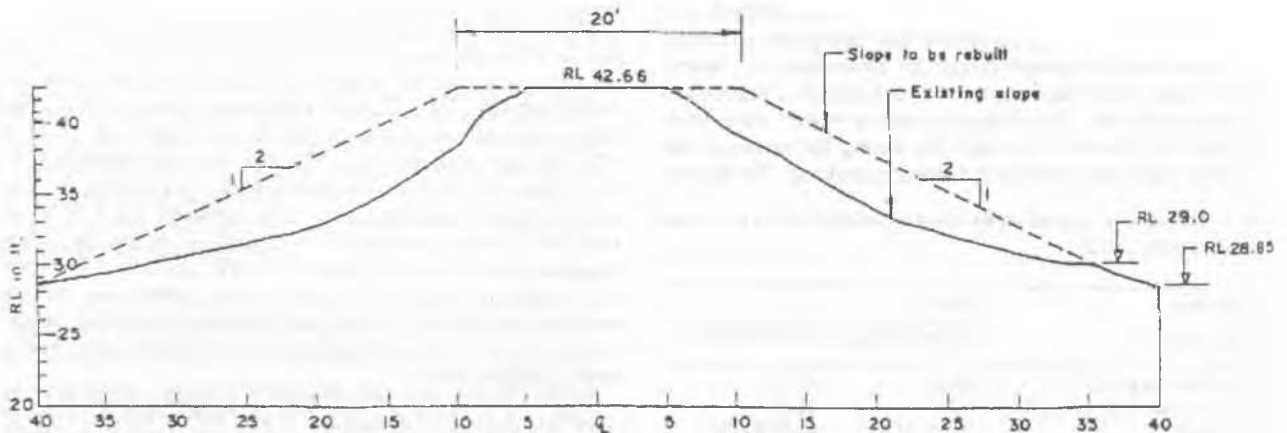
Typical cross-sectional profile of railway embankment in Ishurdi-Sirajganj route.
